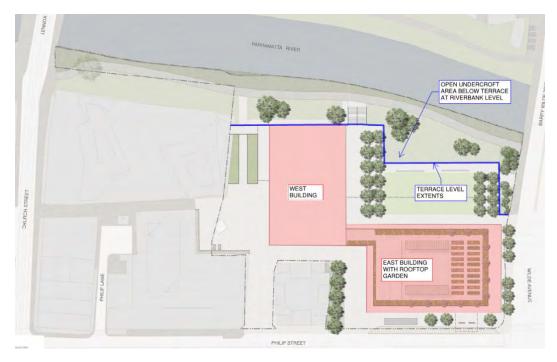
Post-development architectural plan (source: McGregor Coxall Powerhouse Parramatta SSDA issue dated 02/04/2020)
